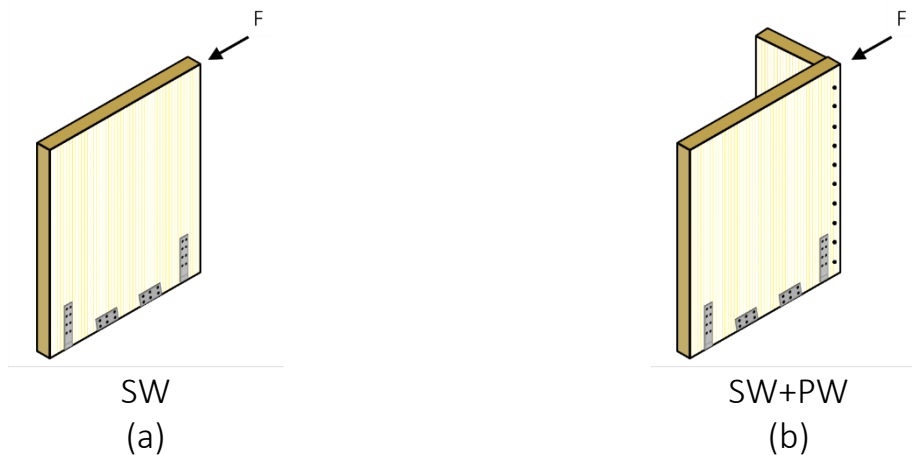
(a) Single shear wall; (b) shear wall connected to a perpendicular wall.
